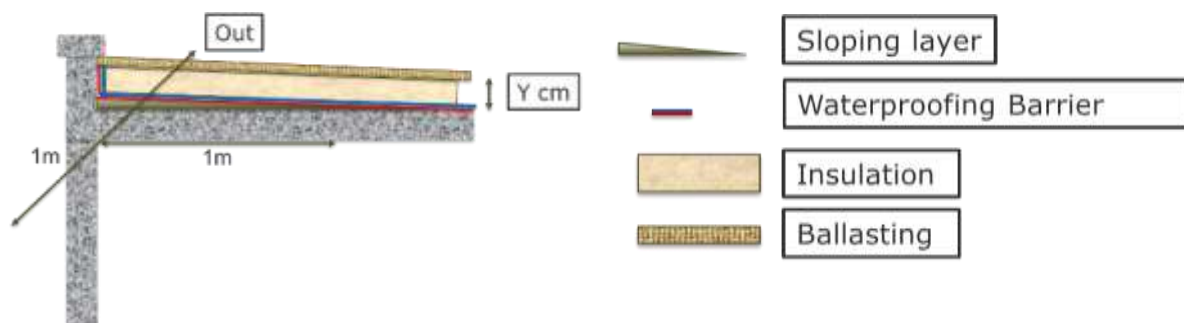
Cross section of non-accessible flat roof (inverted roof)
